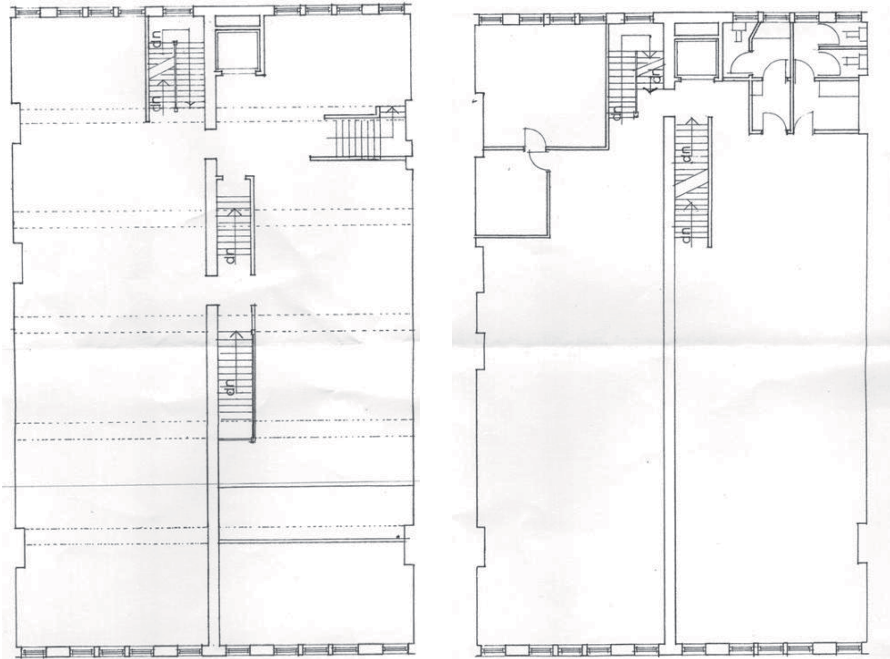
(left) Existing first floor plan of Cooke's Building in 1986
